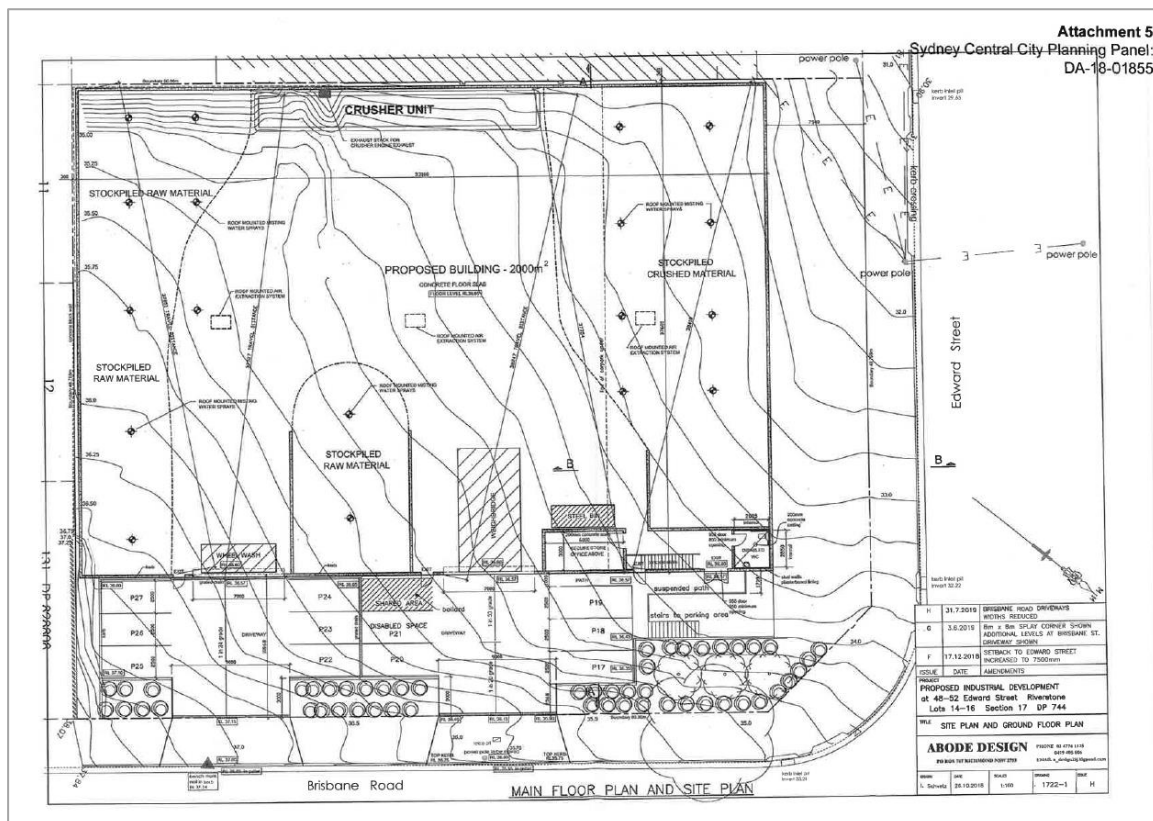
Approved Floor Plan and Site Plan (Source: Abode Design)
